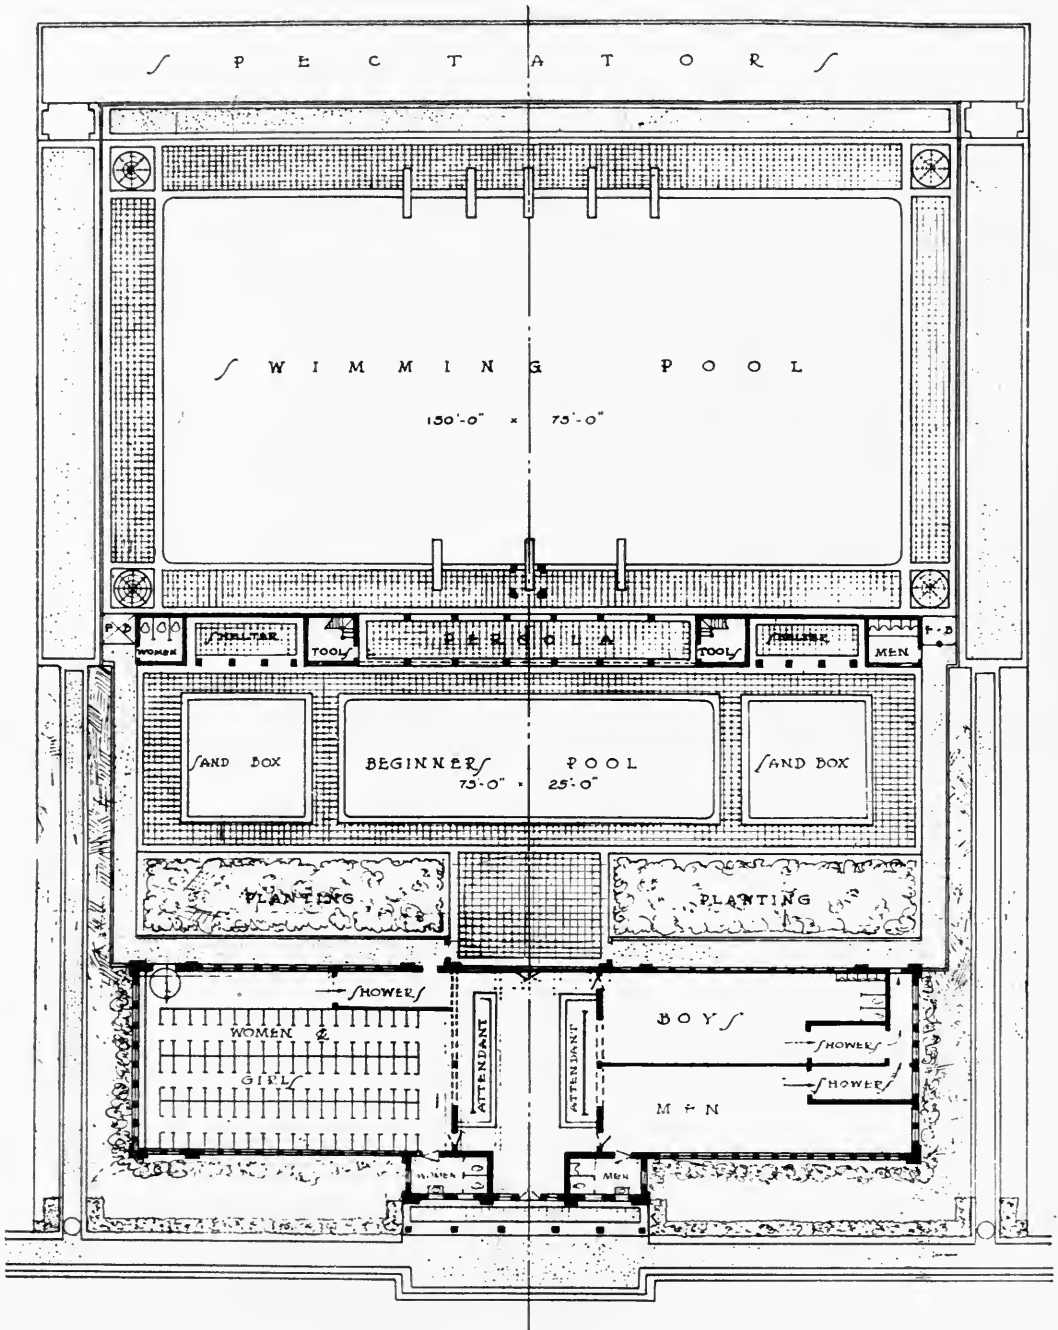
MCKINLEY HIGH SCHOOL POOL, WASHINGTON, D. C.
